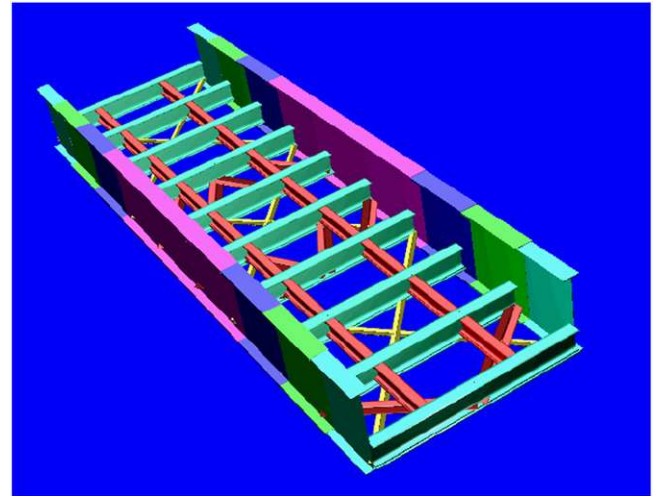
Rendered finite element model of the reinforced bridge structure.
